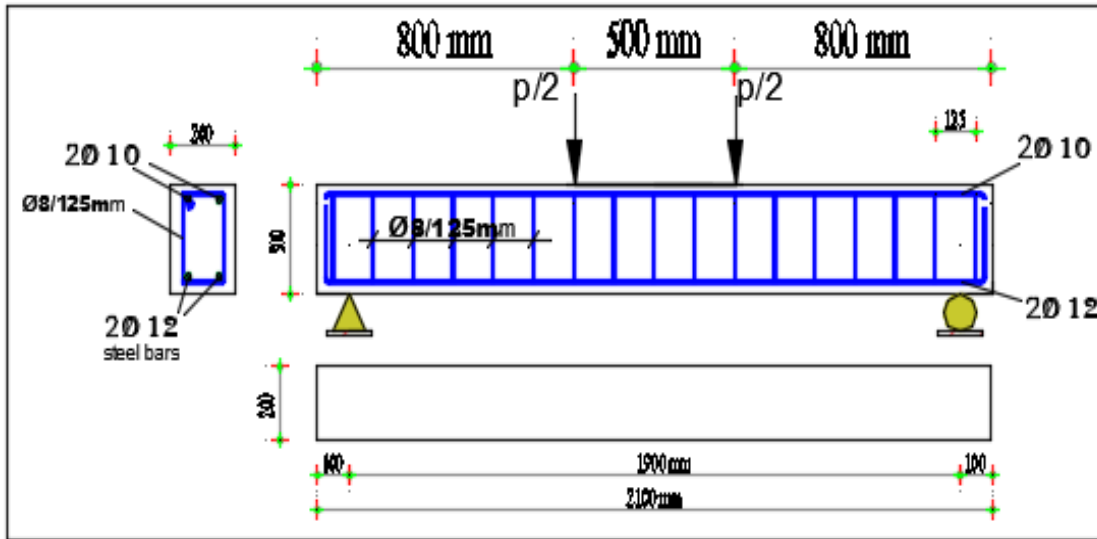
Details of the control beam as illustrated by bottom and cross-sectional views of the concrete beams.
